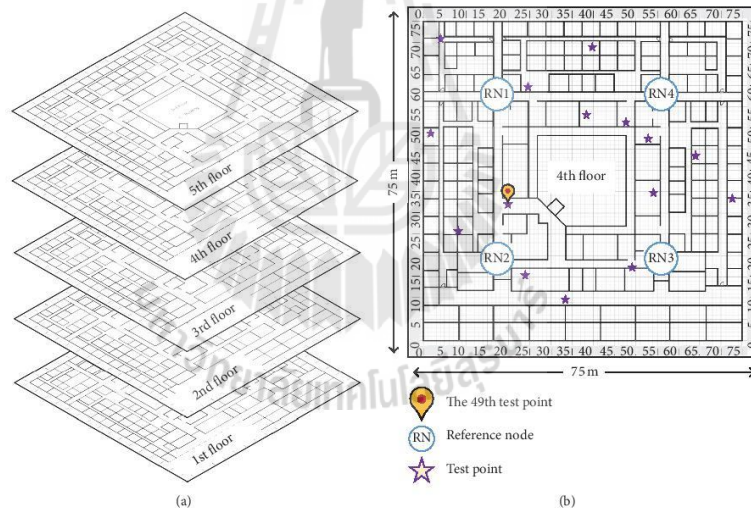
Building B. (a) The five-story structure. (b) Floor plan and example of 15 test points labelled with stars on the 4th floor.
